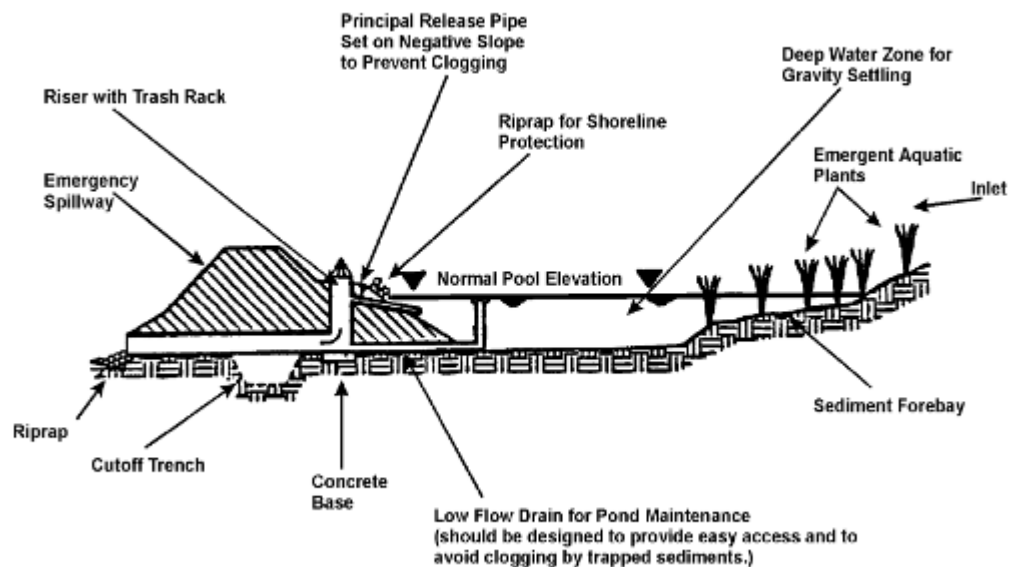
Typical Layout of a Wet Detention Pond (from Maryland Department of the Environment, 1986).
